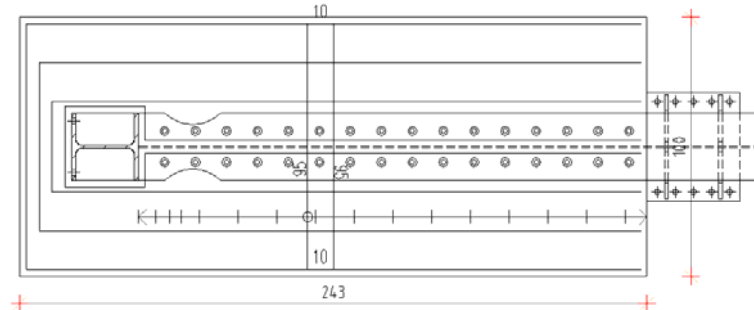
Reinforcing of the concrete slab around the RBS joint
